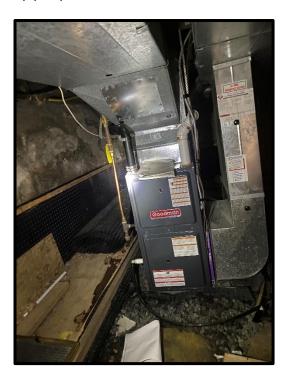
View inside the 339 Roosevelt Avenue dwelling.
